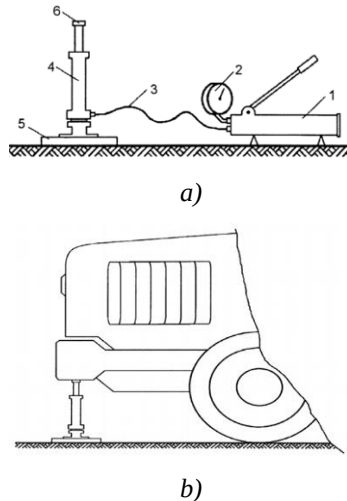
Scheme of static stamp testing of soils: a) elements of stamp equipment
